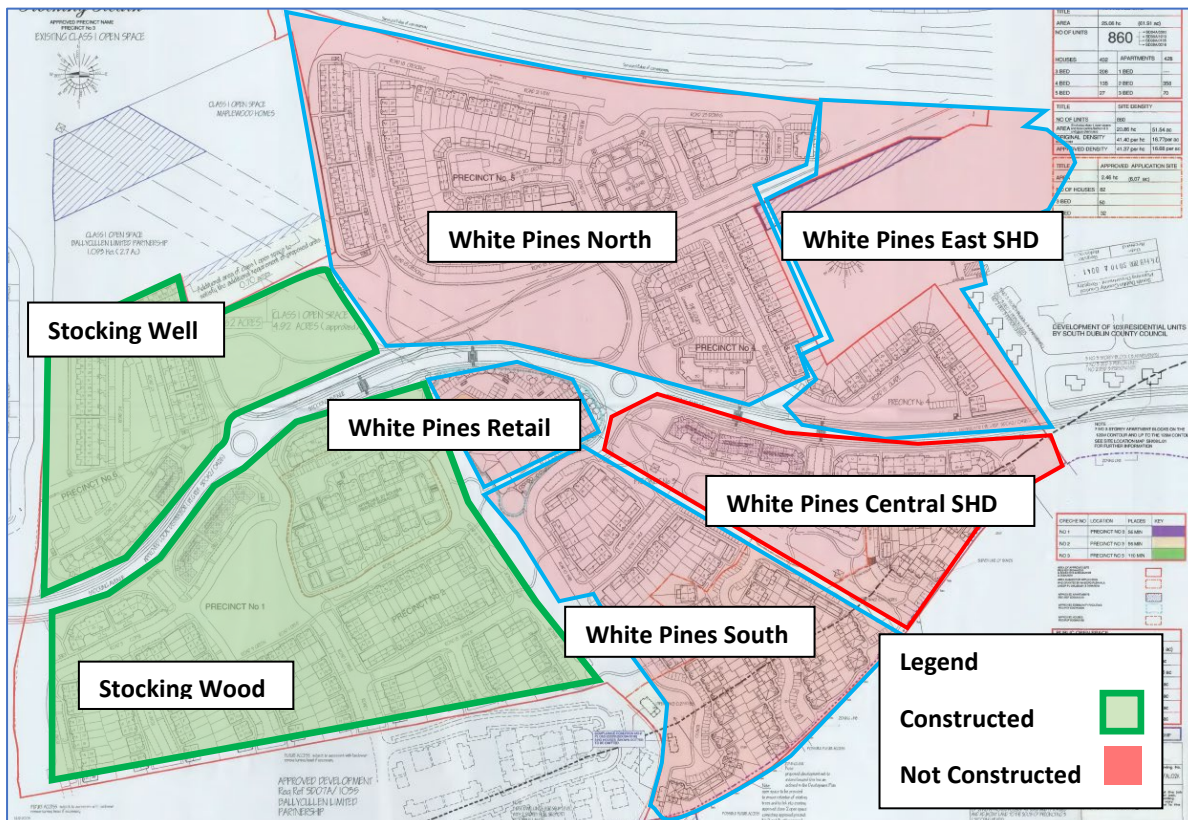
Site Layout Plan SDCC Reg. Ref. SD10A/0041 (annotated by TPA)
